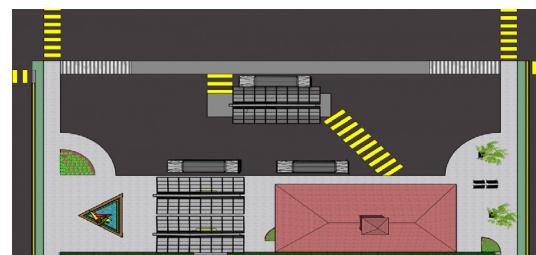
Plan view of transit station. The proposed transit zone is located in close proximity to the mixed-use core.
